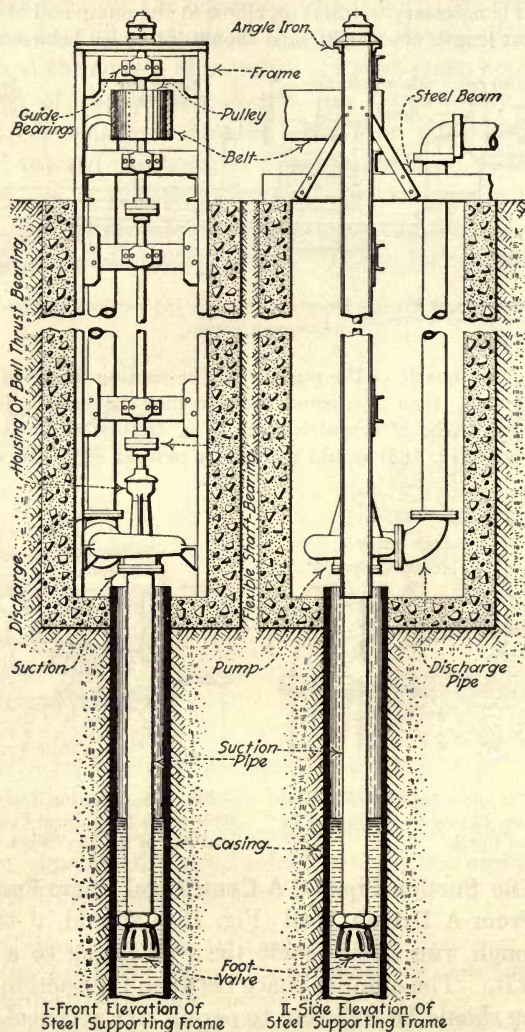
Centrifugal Pump Drawing Water From A Driven Well.
